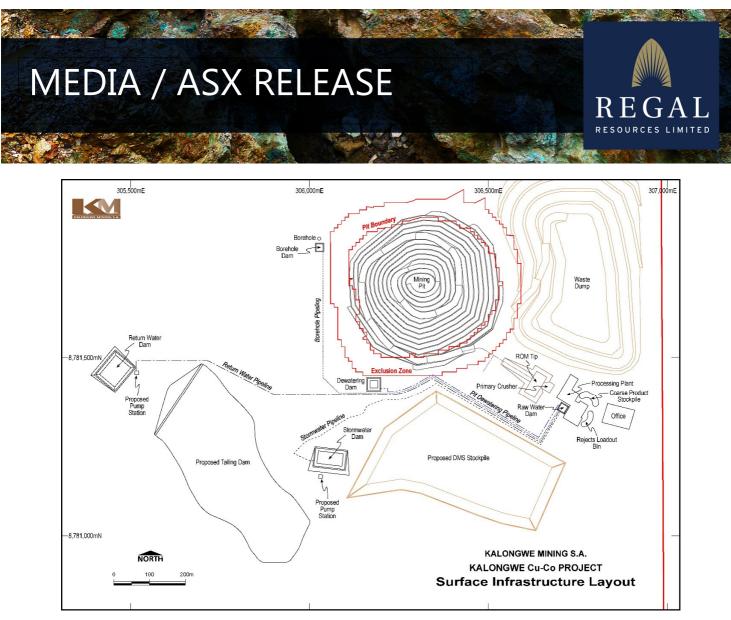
Shows the plant and site layout including the plant, plant services, infrastructure and mine layout.
